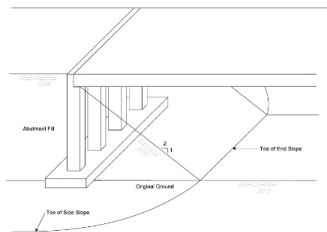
Spill-Through Abutment on Combination Strip Footing
